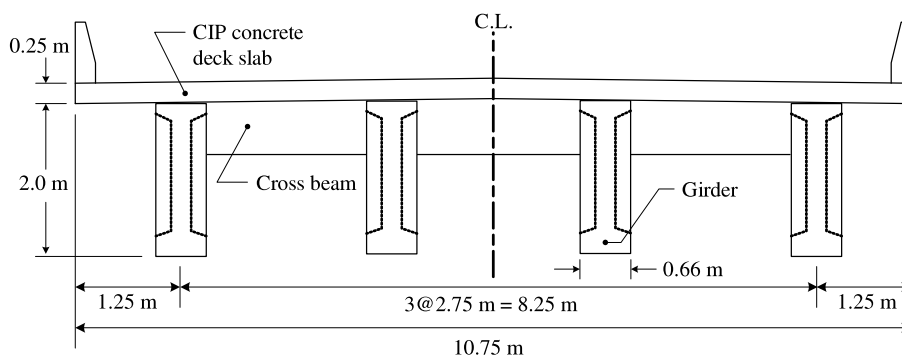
Cross-section of a typical precast PSC I-girder bridge.
